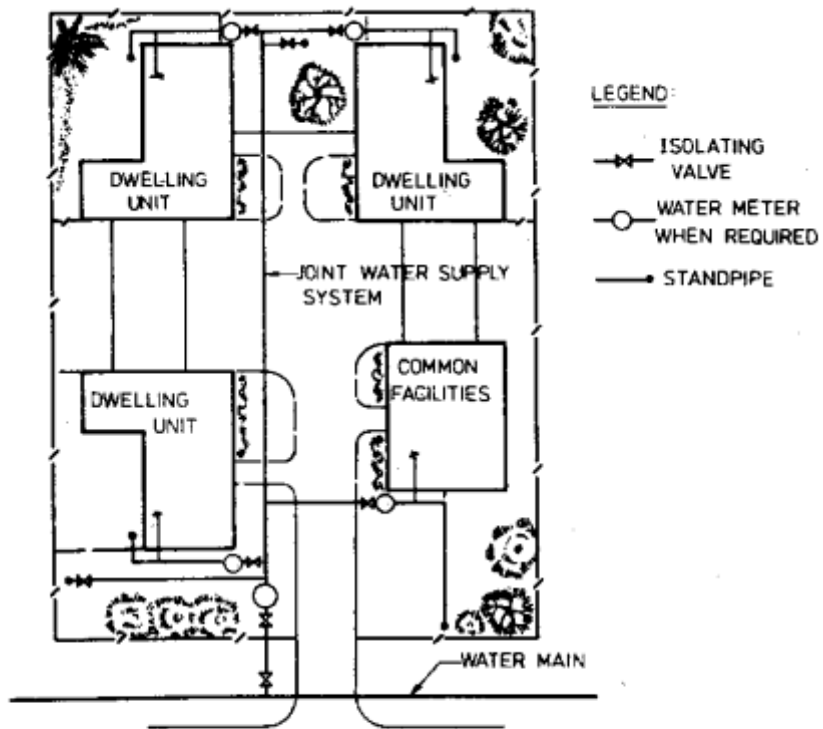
JOINT WATER SUPPLY SYSTEM
